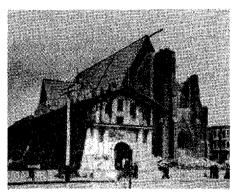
Mission Dolores, left, undamaged in 1906 San Francisco California earthquake although constructed in 1777. Newer church, right, was severely damaged.
